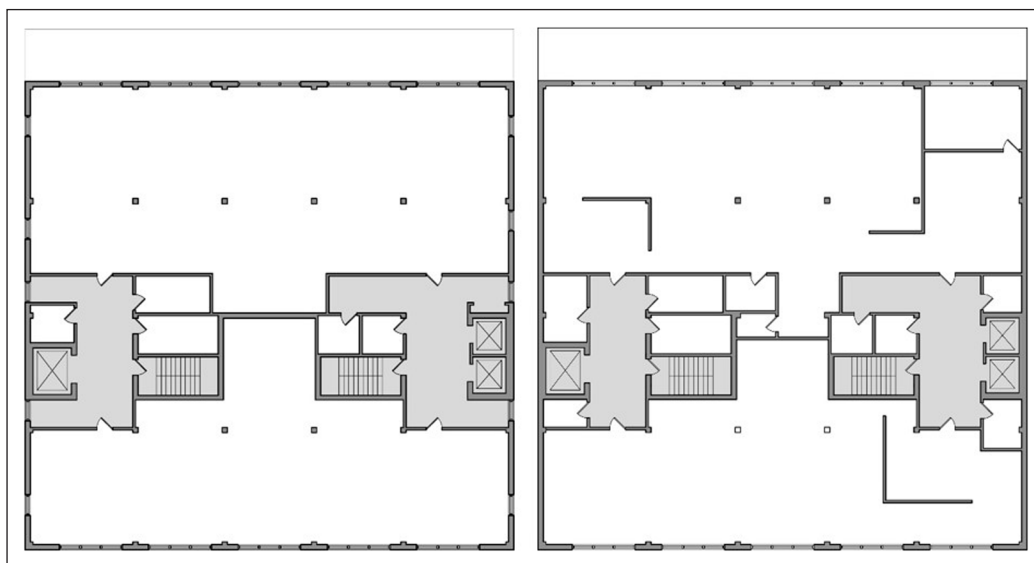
Plan of the fourth floor of building 16 in 1914 (left) and 1973 (right).
